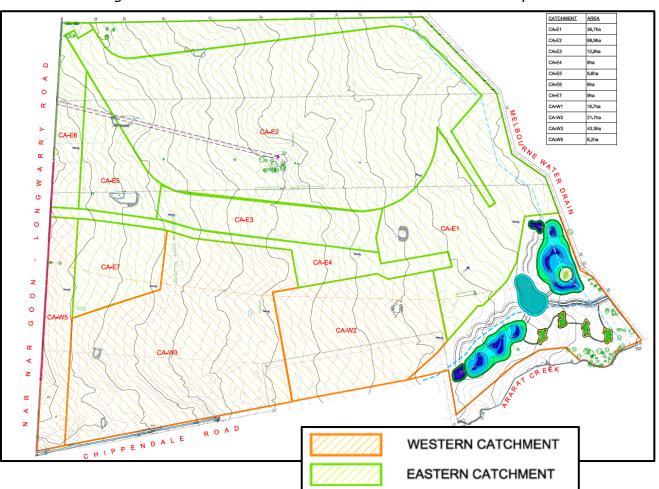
Pakenham Racecourse – Stormwater Master plan
